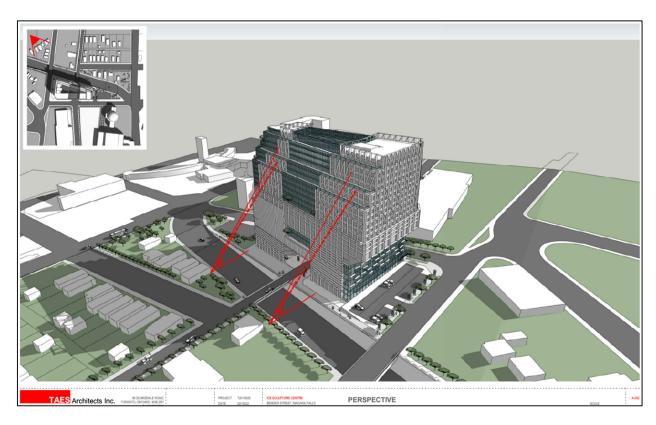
Rendered Angular Plane from Building to Adjacent Neighbourhood
